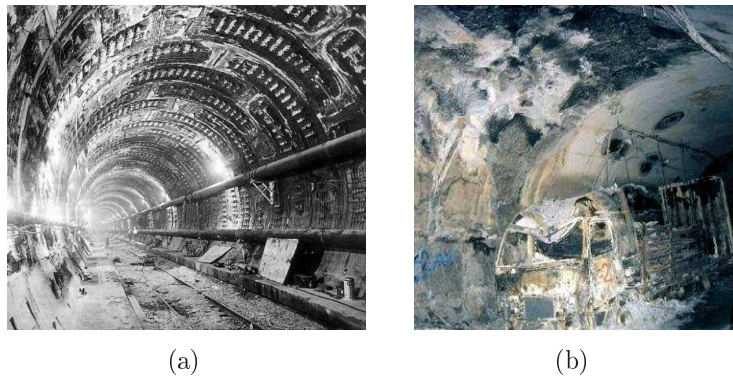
Damage of tunnel lining showing severe spalling: (a) Channel Tunnel (1996) [18] and (b) Mont-Blanc Tunnel (1999) [51]
